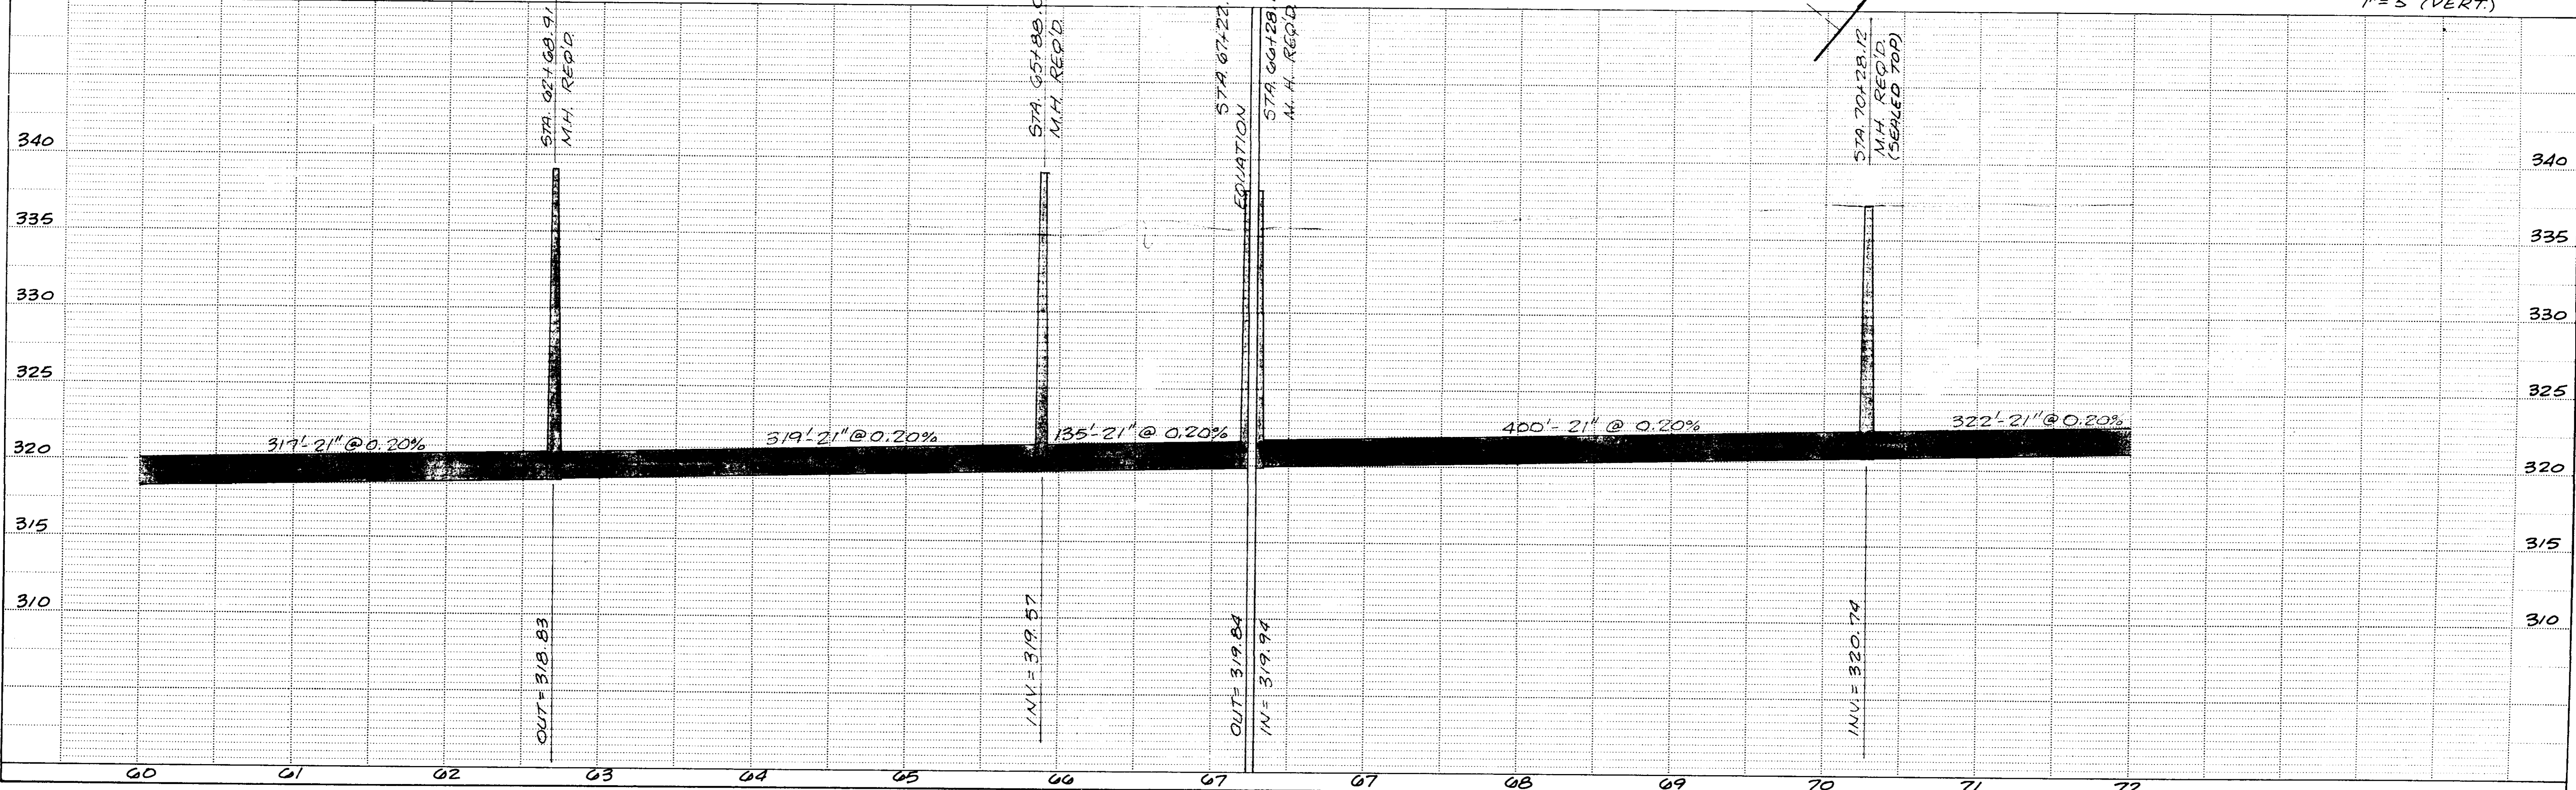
SINGLE PLAN AND PROFILE-FULL DOT
